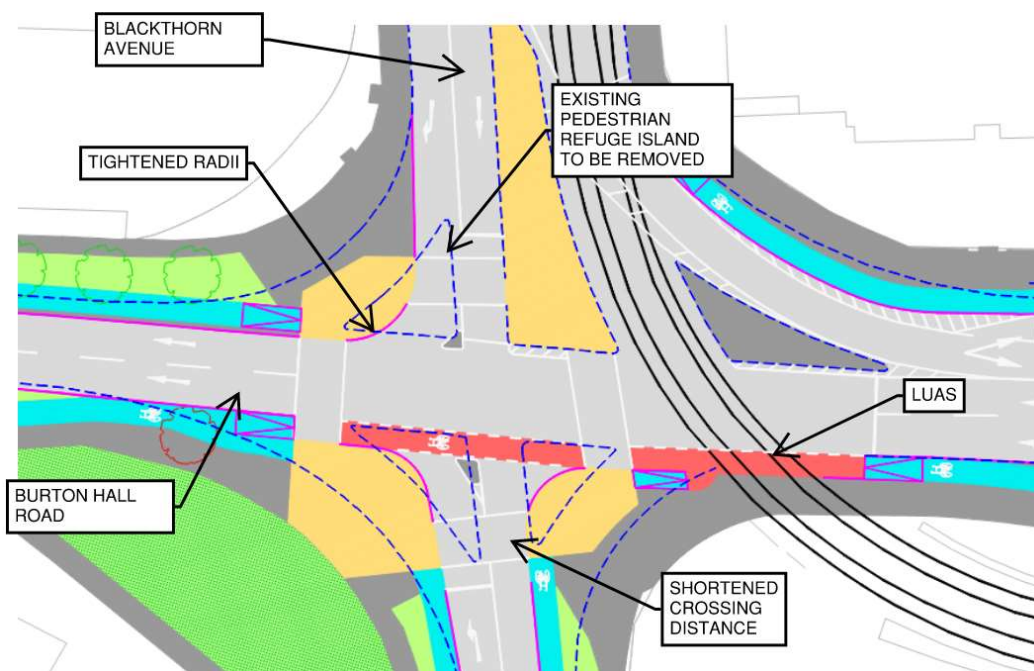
Burton Hall Road/Blackthorn Avenue Junction
